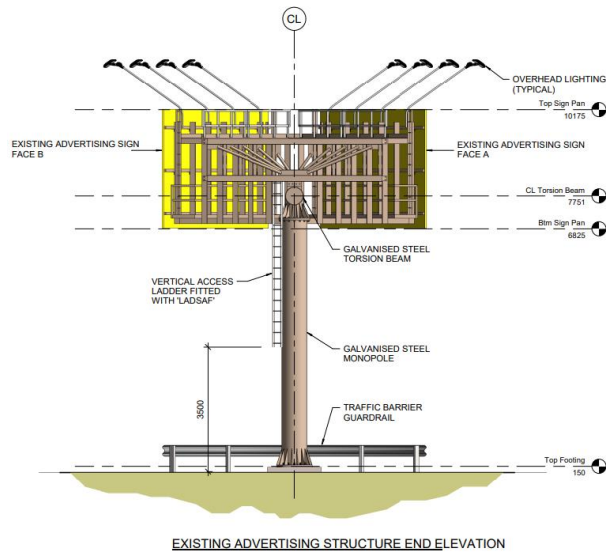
Proposed elevation of the billboard and advertising signage structure (Source: Arcadis)
